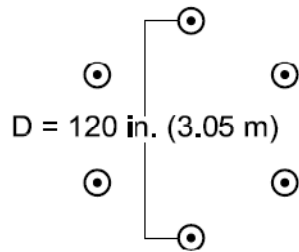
Cross Section of the UHPC Lattice Tower at Tower Top
